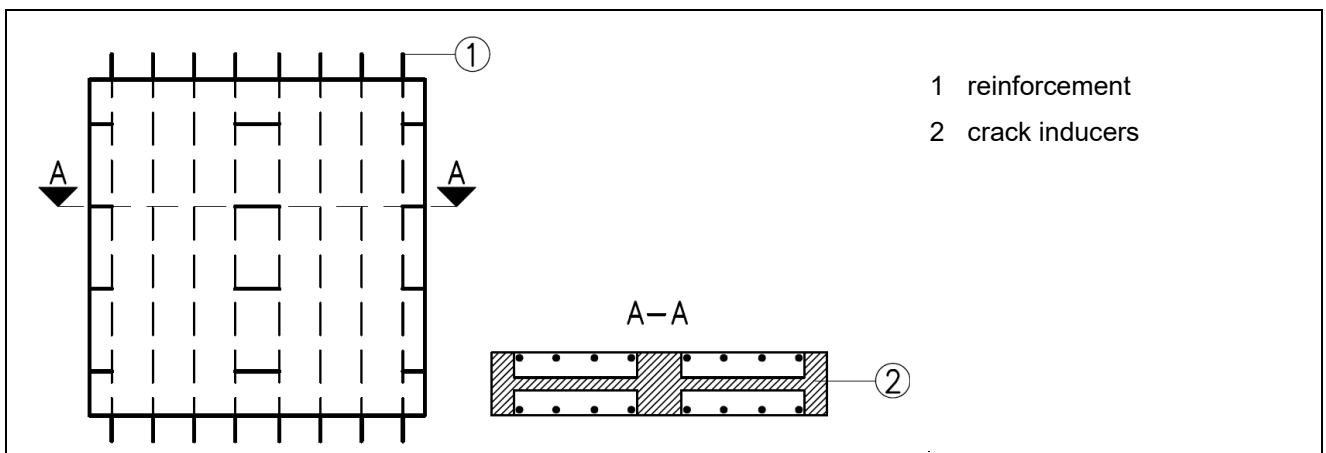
Example of a test member for fasteners tested in cracked concrete
